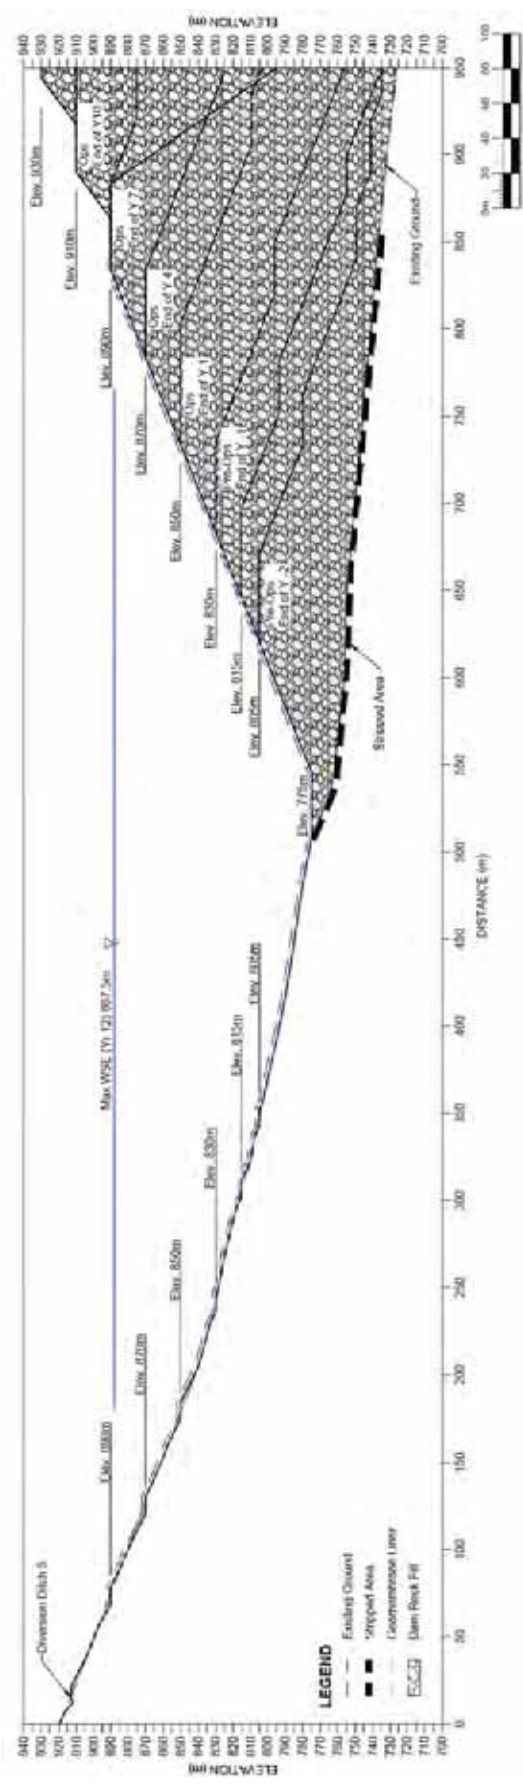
Cross Section of the TMF and raises to Final Design Elevation (SRK, 2020)
